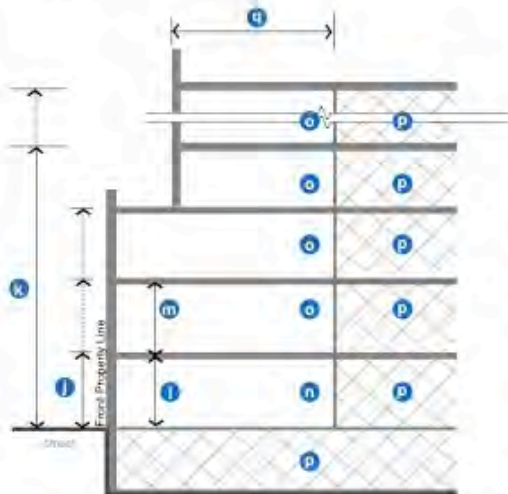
(2). Storefront Building: Height & Use Requirements.
